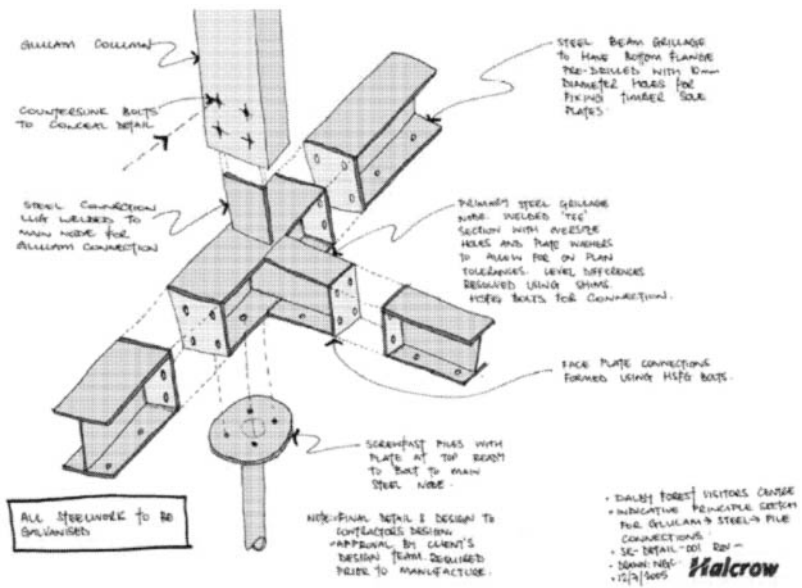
Schematic diagram of the steel grillage connection to the top of the helical piles. (Rendering courtesy Halcrow Yolles)
